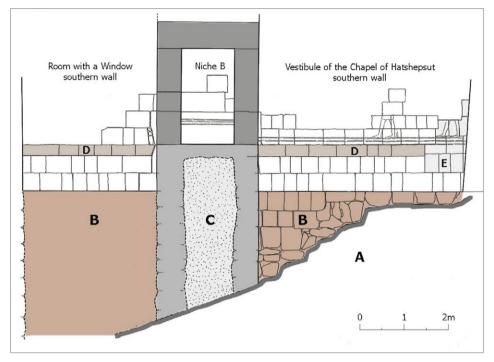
Cross-section of the eastern wall of the Vestibule of the Chapel of Hatshepsut with a view of its southern wall and of the southern wall of the Room with a Window. A – Esna shale; B – stone foundation of the walls; C – rock debris; D – third layer of blocks leveling the walls and the platform under the niches; E – earlier fragment of the wall (PCMA UW | drawing A. Kwaśnica, based on a drawing of A. Brzozowska-Jawornicka)
